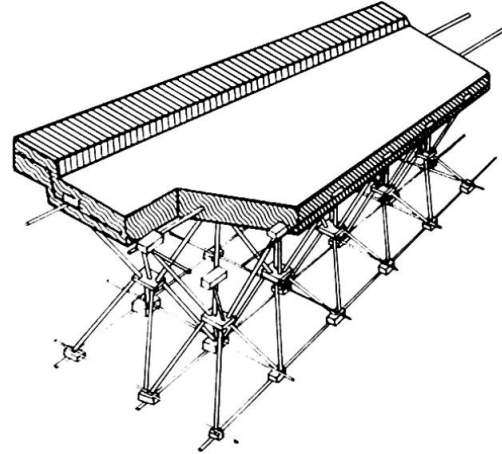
Isometric Detail of a Rural Spatiostructural Bridge (Sketch)
